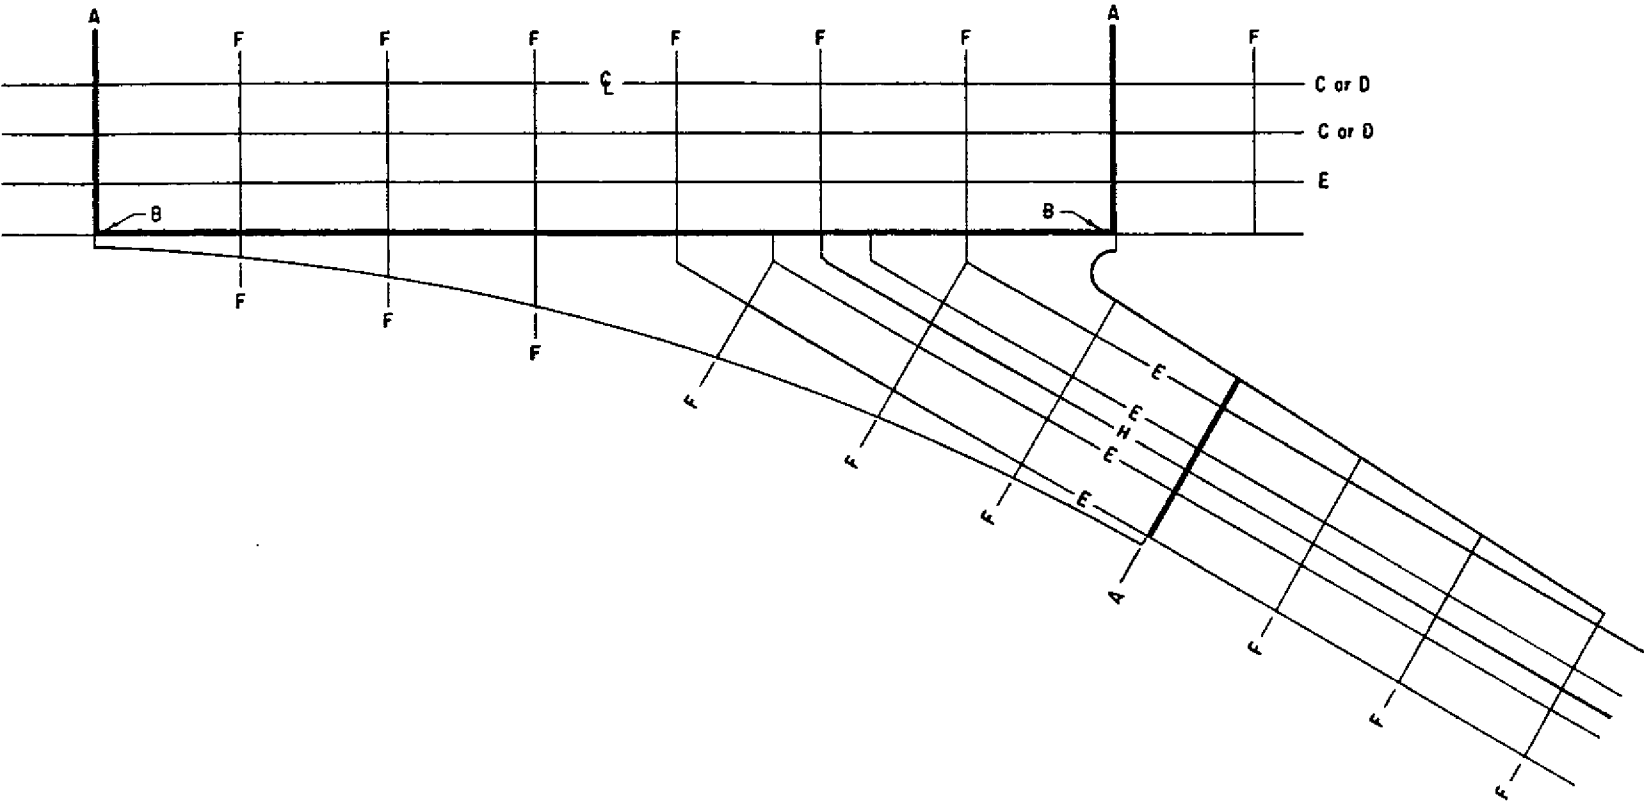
ARRANGEMENT OF JOINTS AT INTERSECTION OF RUNWAY AND TAXIWAY (REINFORCED)
